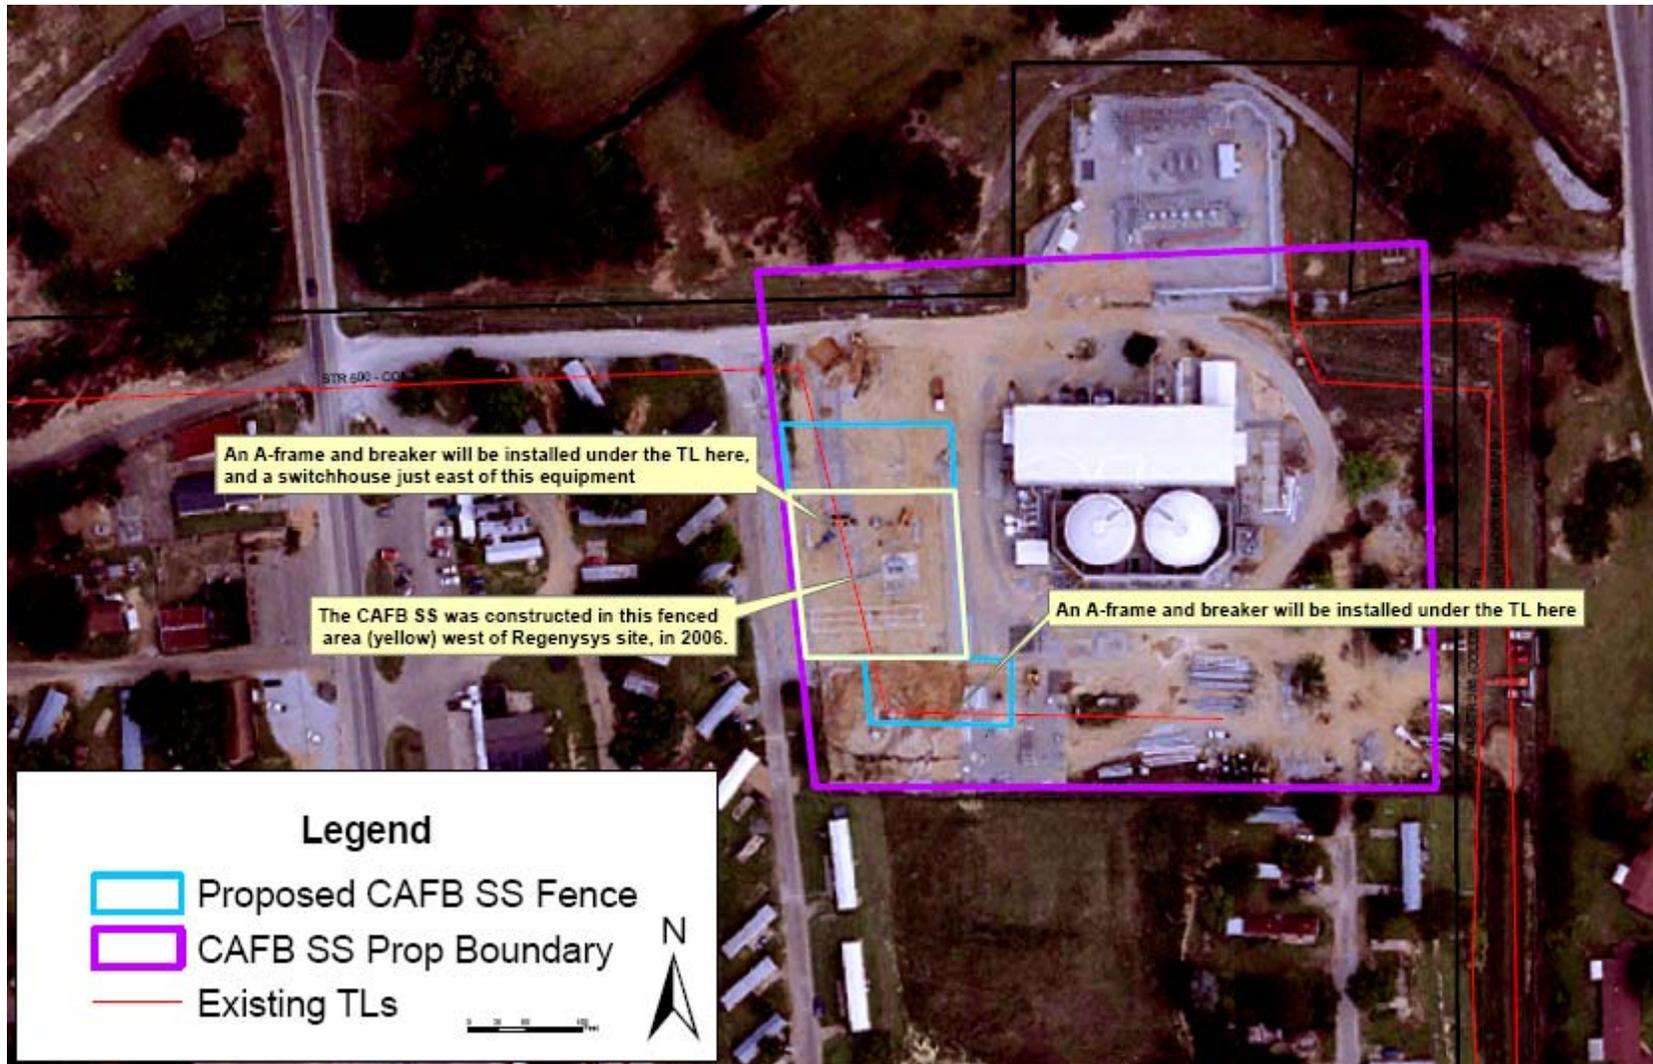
Aerial Photograph of Proposed Columbus Air Force Base Substation (CAFB SS) Expansion Site
